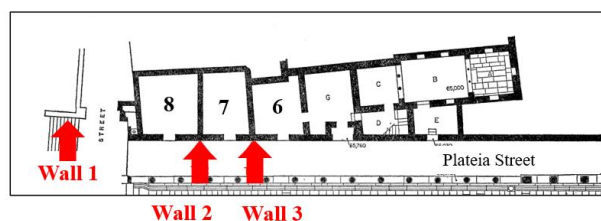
Plan of part of Plateia Street, the southern covered walkway and the underground rooms of the building.
